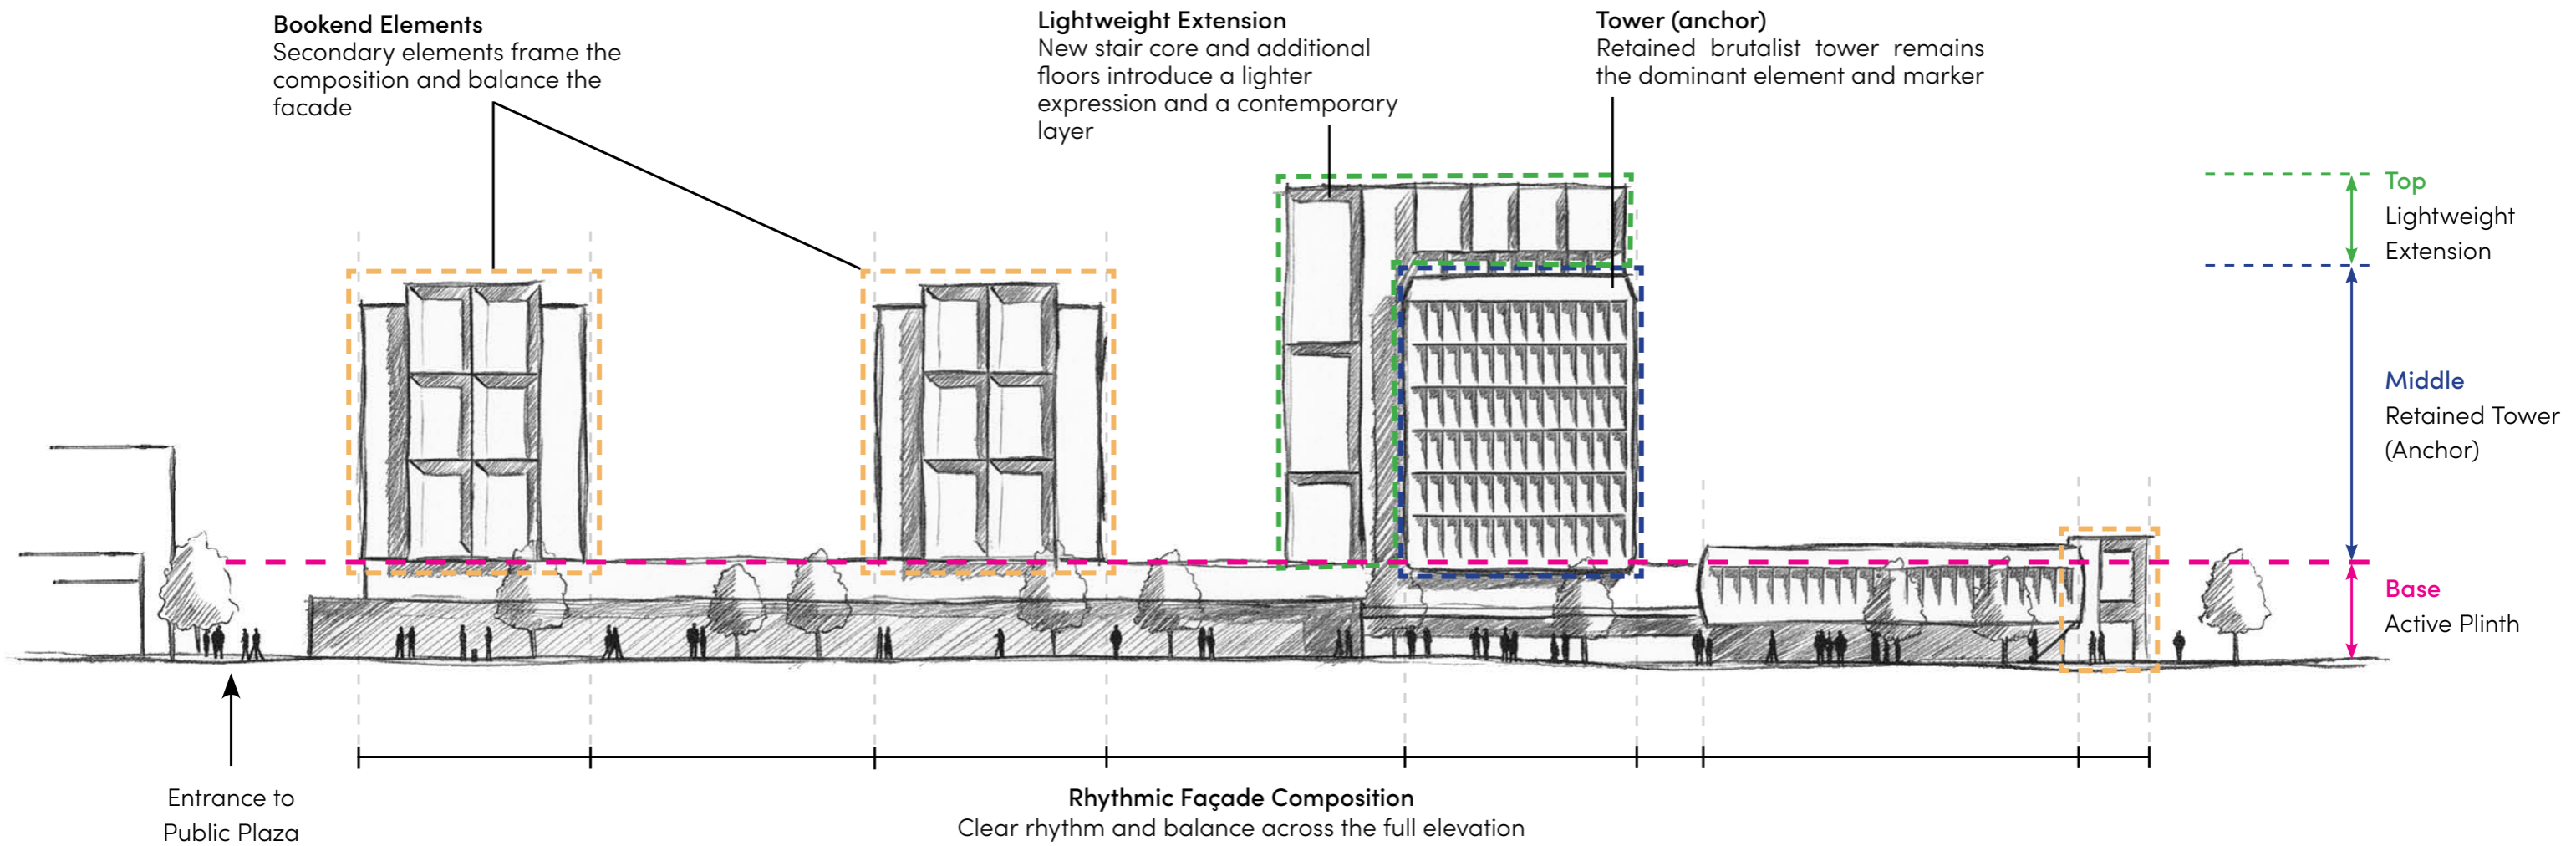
Sketch-design elevation to Phibsborough Road explaining the architectural intent of the proposal. Source: MCORM, 2026.
